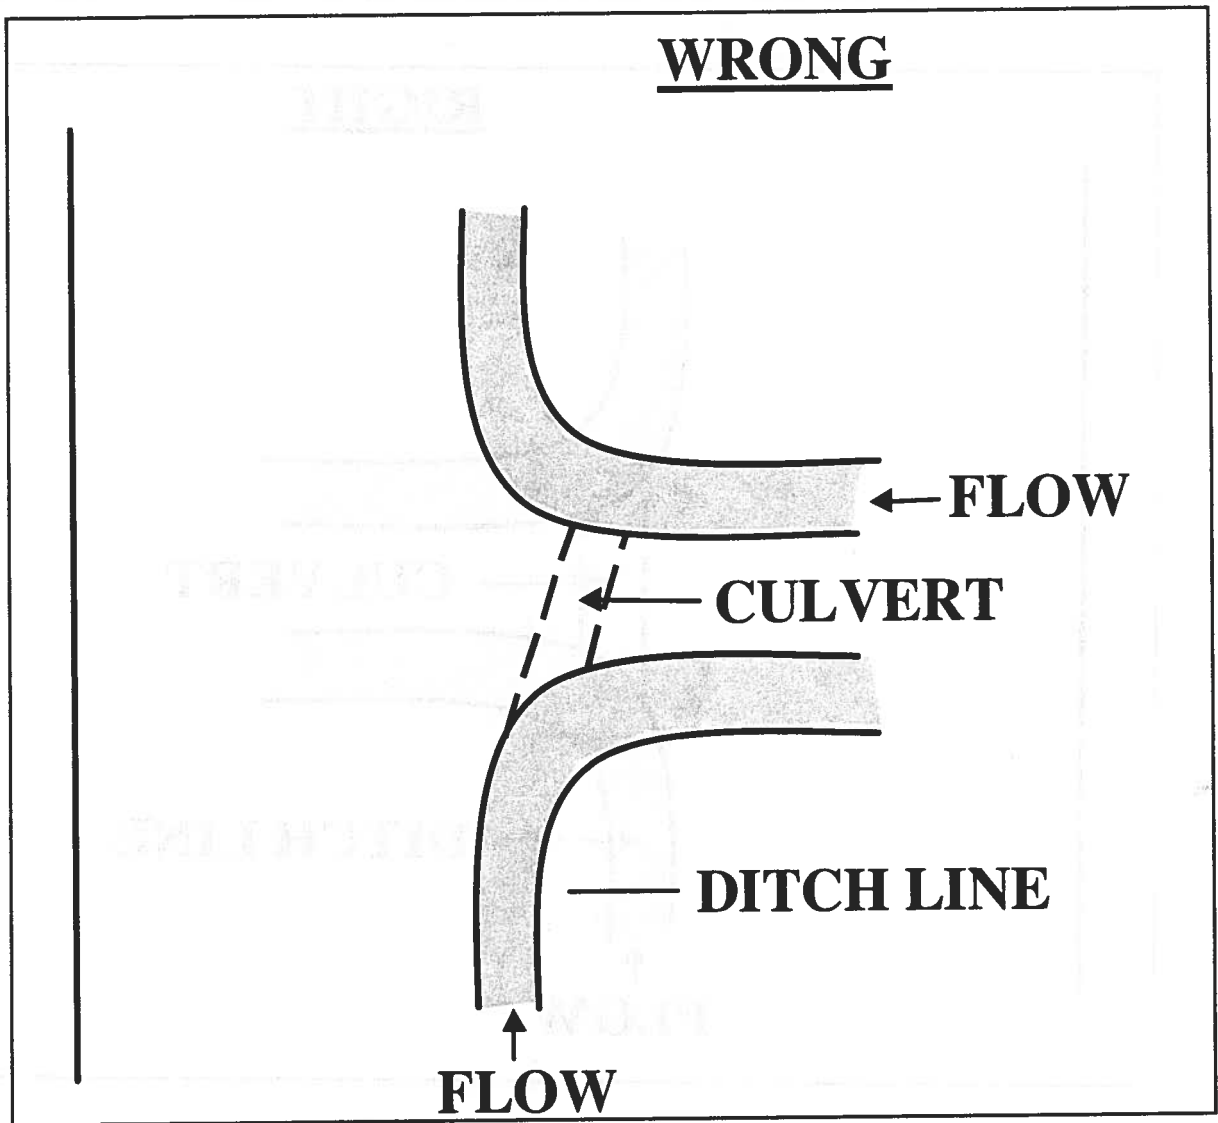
Poor Culvert Placement Under Intersecting Road.
